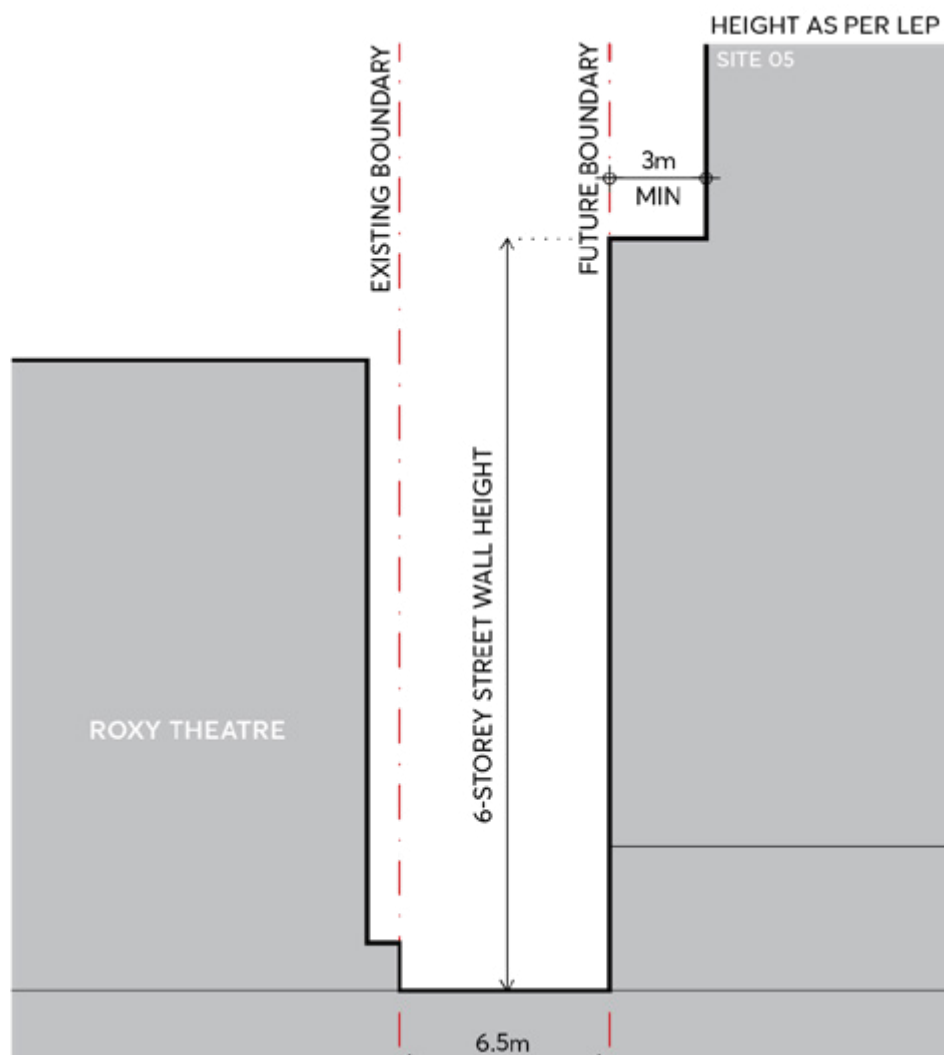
New Laneway between the Roxy and Site 05 (Section F)
